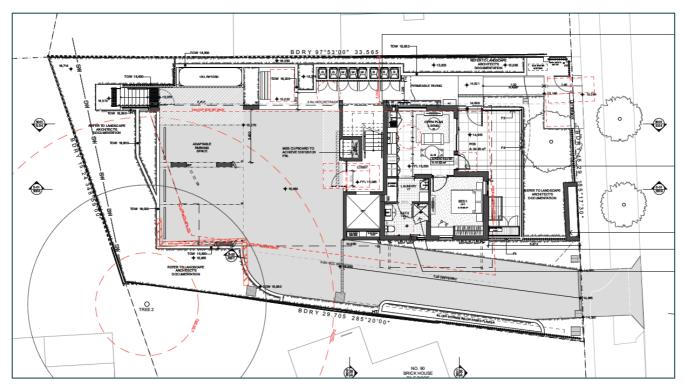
Extract from Architectural Plans – Ground Floor Plan (Source: Integrated Design Group, dated 13.12.2024)
